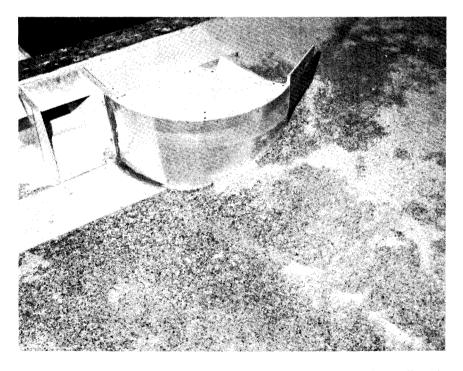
Scour from 300-mm (24 m prototype) radius inlet wall with 210-mm (16.8 m prototype) extension at 120° to right inlet wall. P801-D-79827
